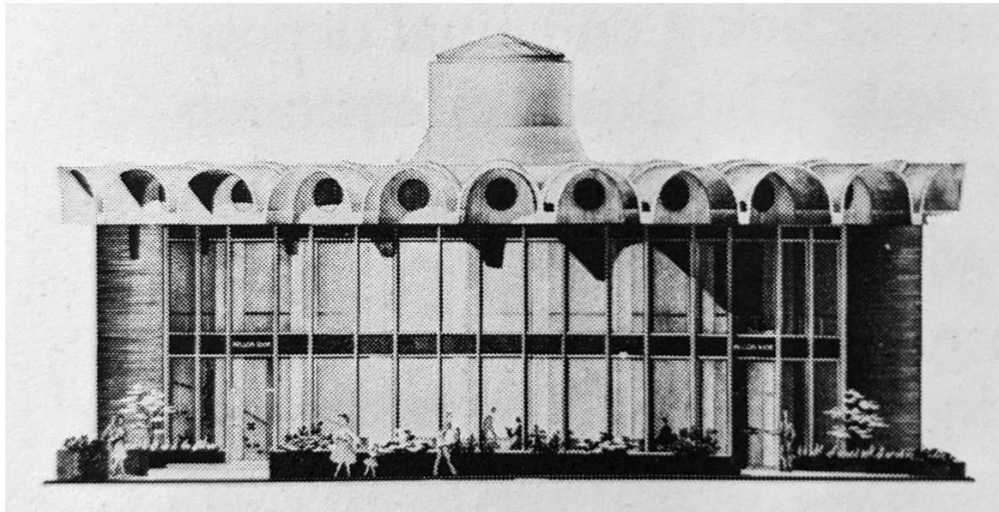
"A Concrete Umbrella". Squirrel Hill branch construction update. Mellon Bank News, Feb 1966. Branch location: 1801 Murray Avenue, Pittsburgh PA 15217.
